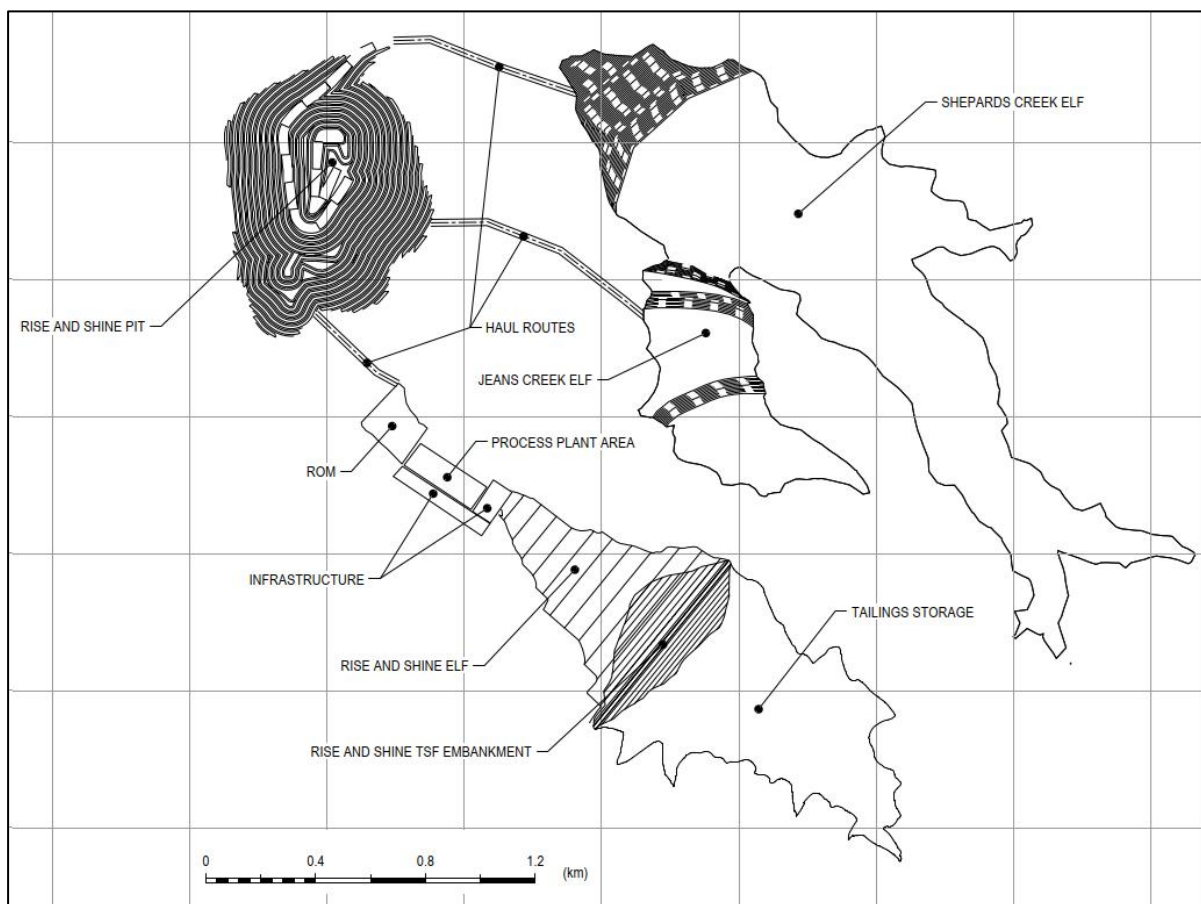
RAS Scoping Study Site Layout showing the location of the pit, ROM, Processing Plant, TSF and the ELF's with an area of approximately 350ha.
